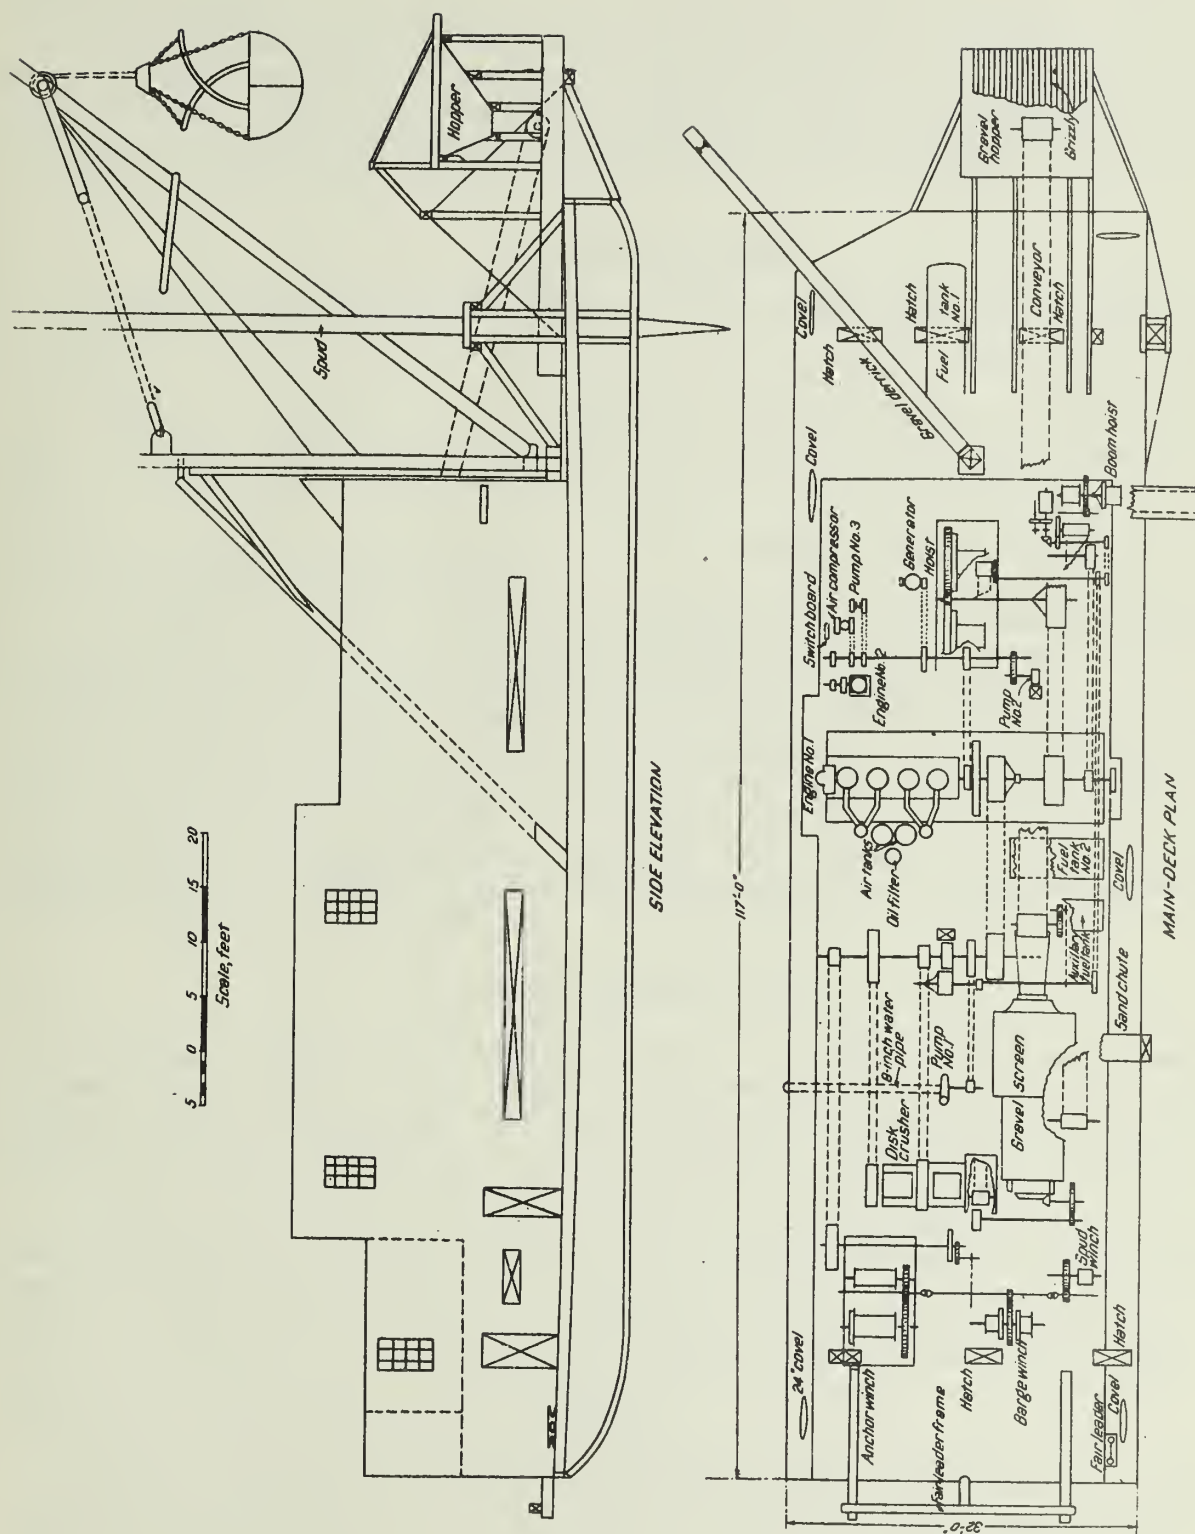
Side elevation and main-deck plan of clamshell dredge.
